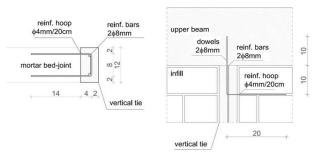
Vertical r. c. confining element reinforcement and construction details in the cross-section (left) and in elevation (right) [4,5]
